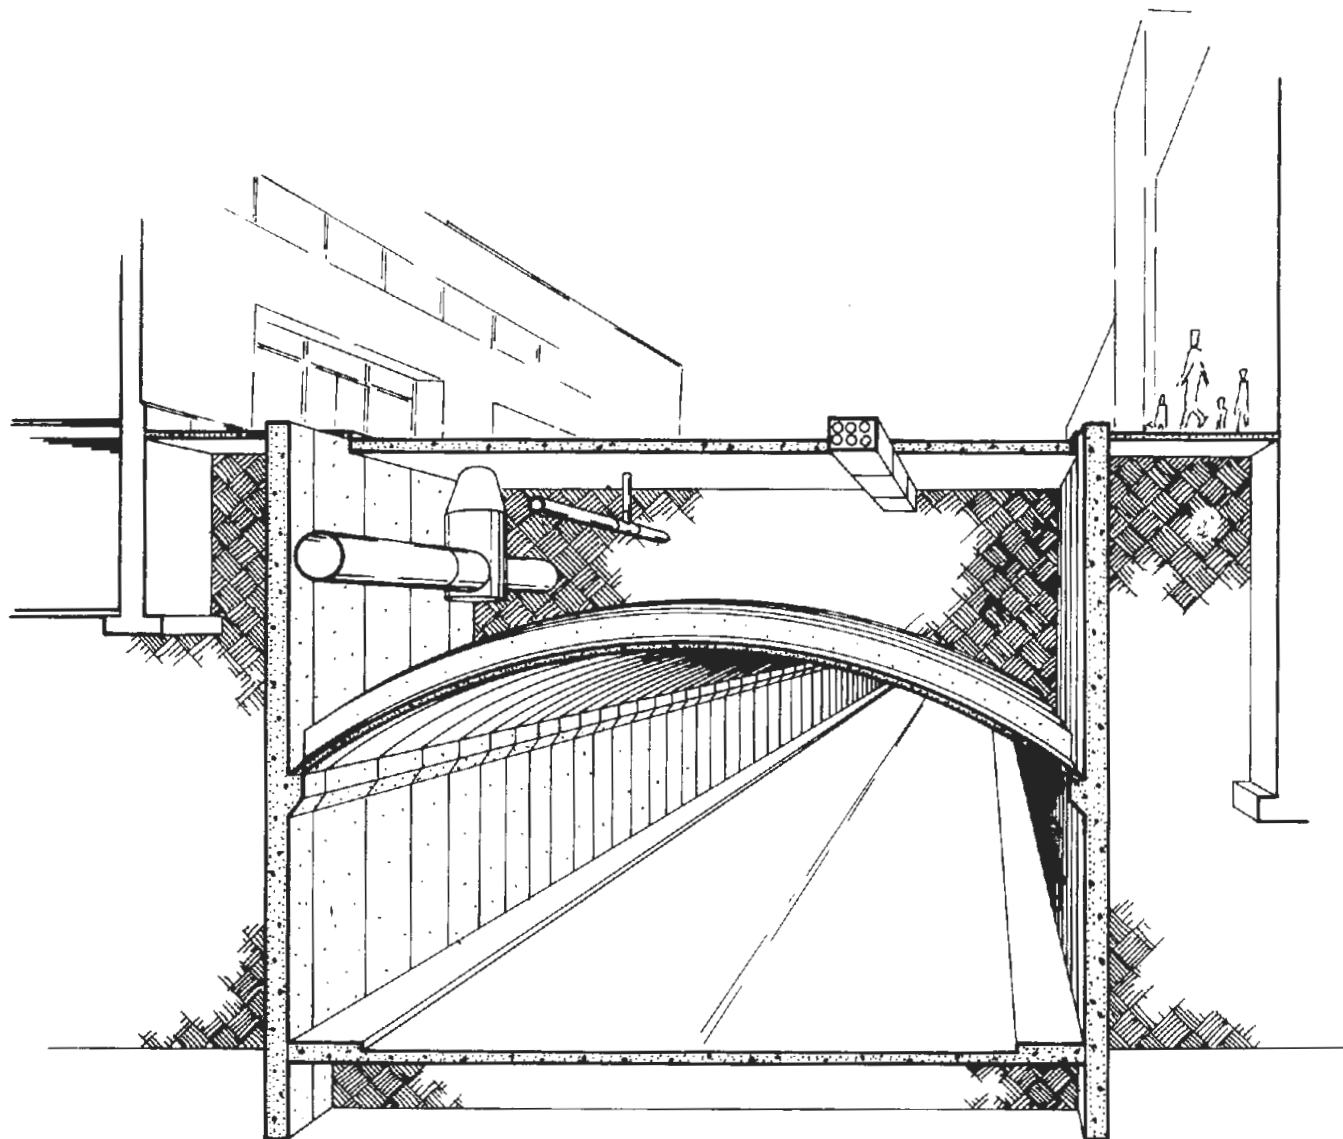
Precast concrete ribbed arches used as tunnel roof.
